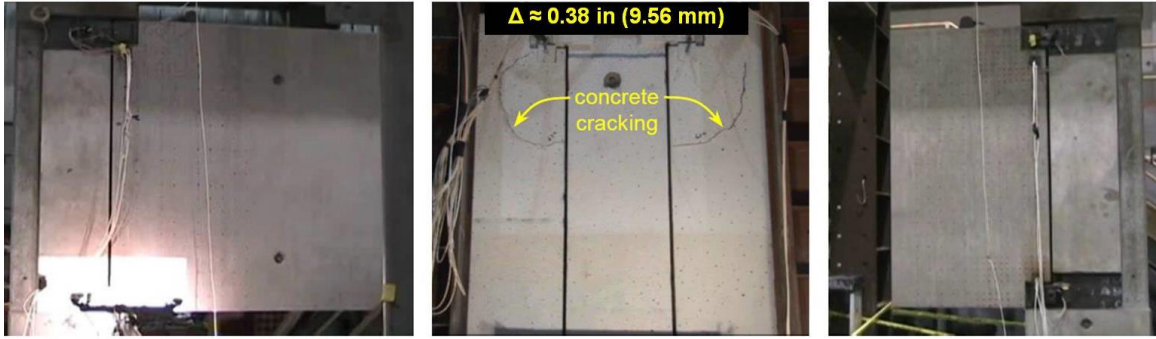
Elevation view of OMRF test specimen, damage per response zones
